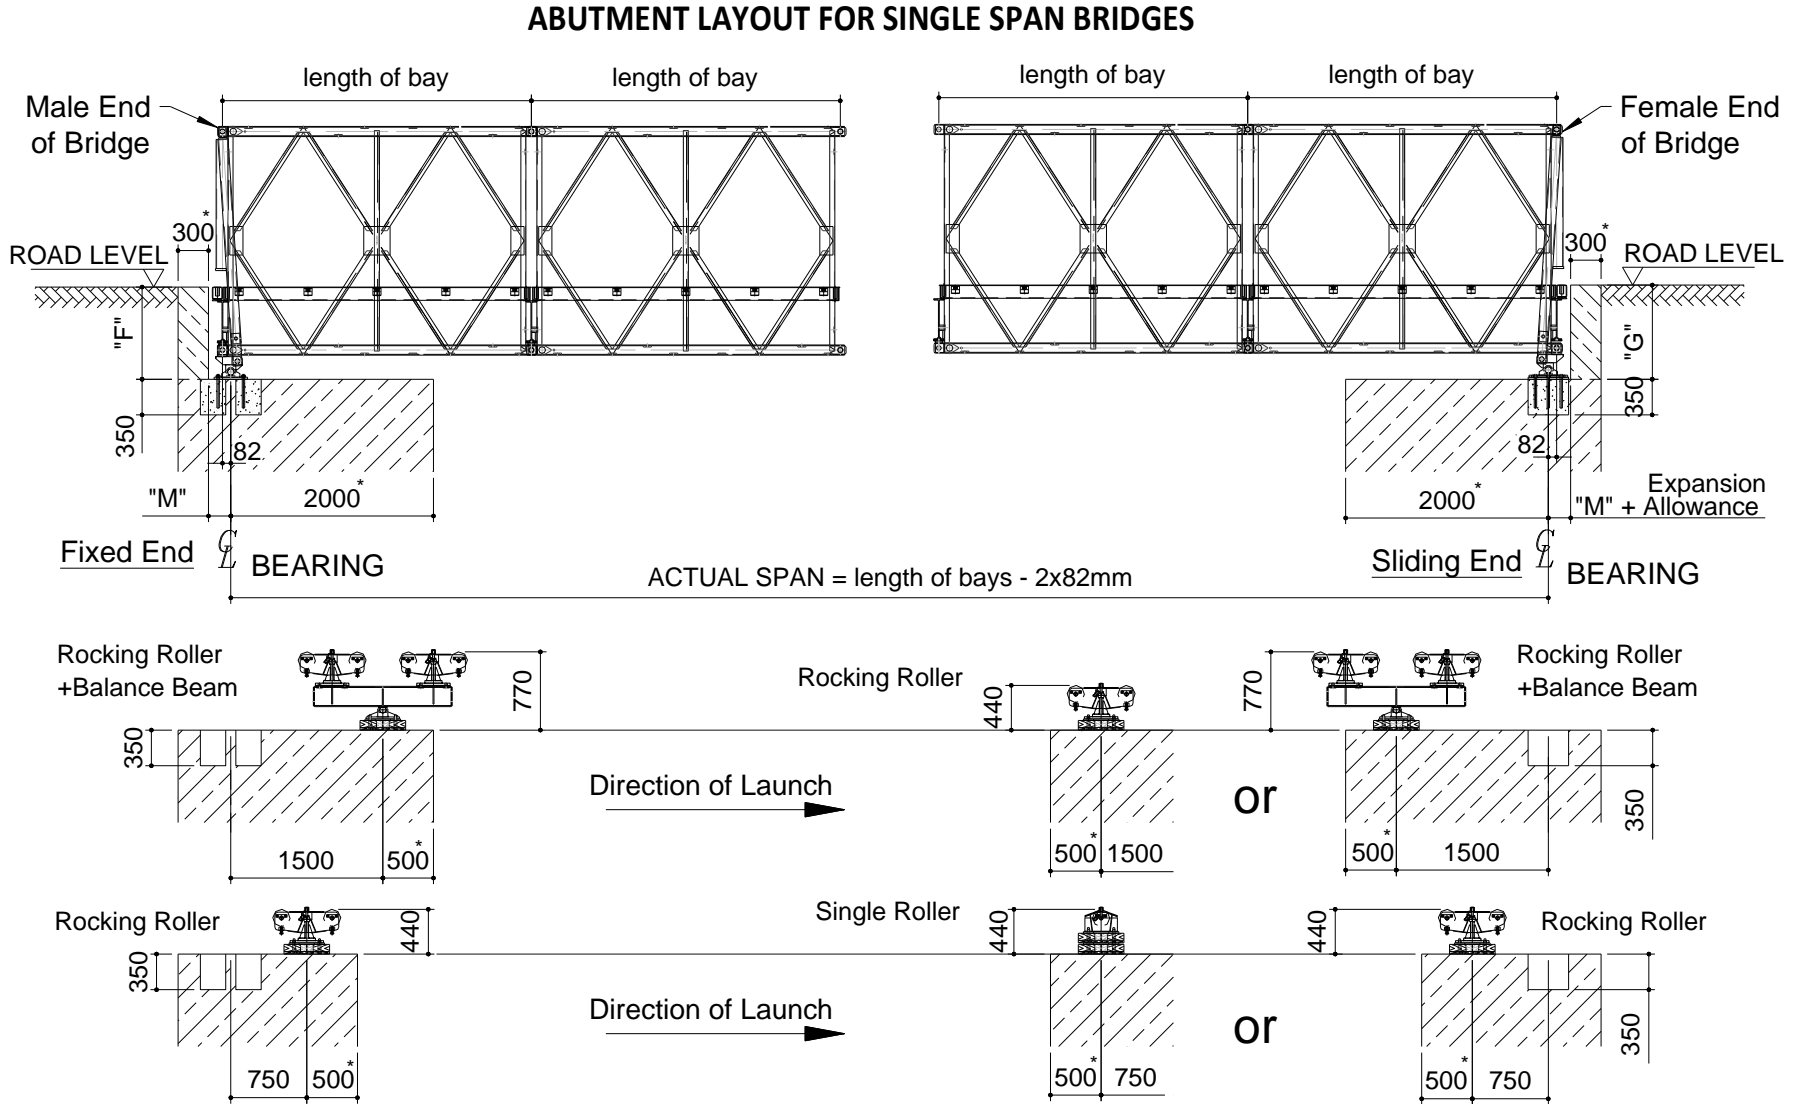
ABUTMENT, BEARING PLATES AND ROLLER LAYOUT FOR SINGLE SPAN BRIDGES – SIDE VIEW
